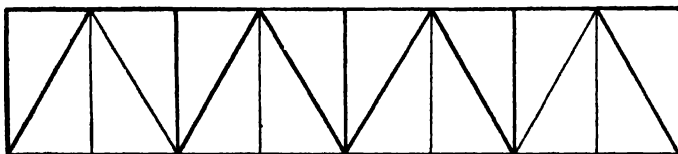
Single-Intersection Warren Truss with Verticals.
